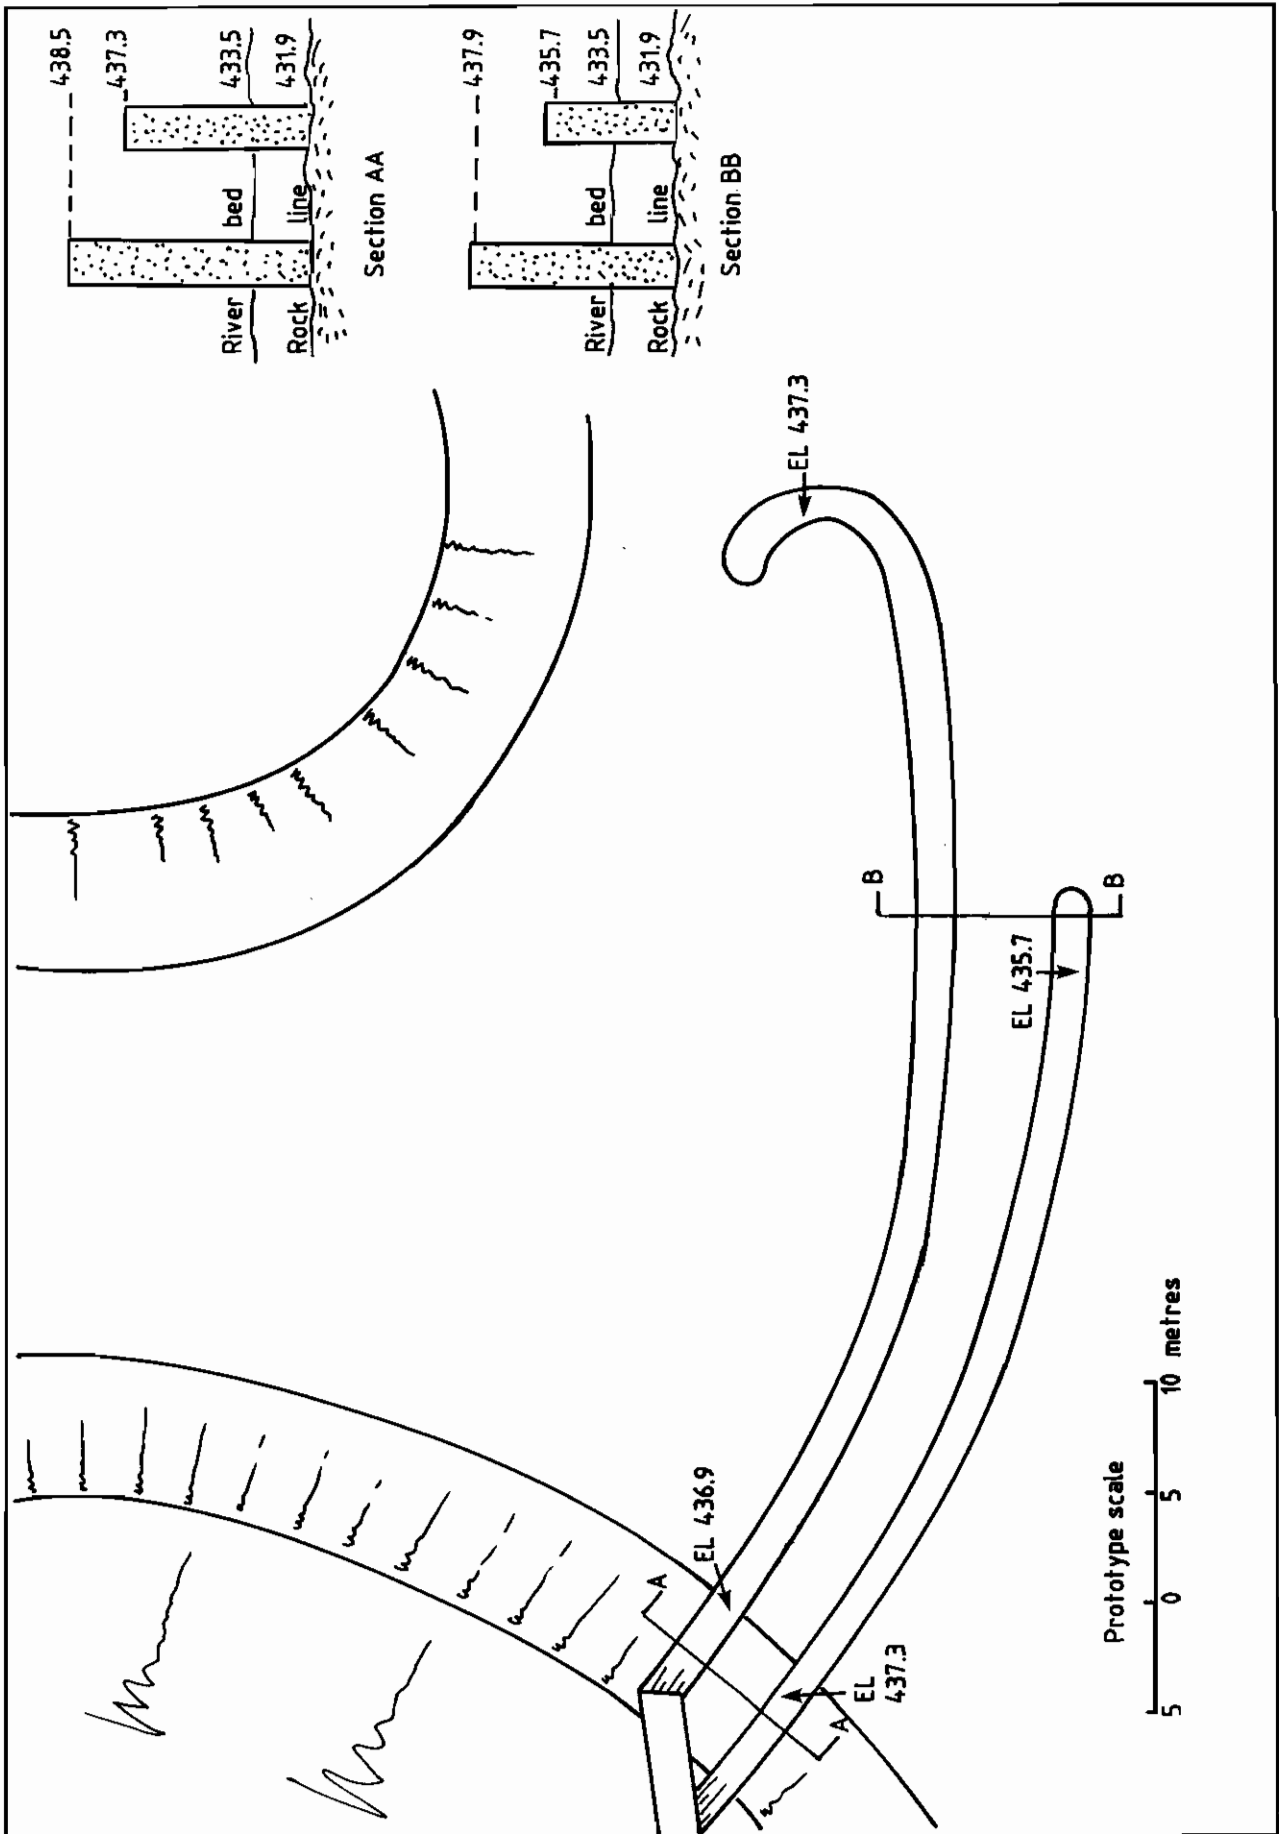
Plan of sediment controlling structure, model of Polgolla diversion
